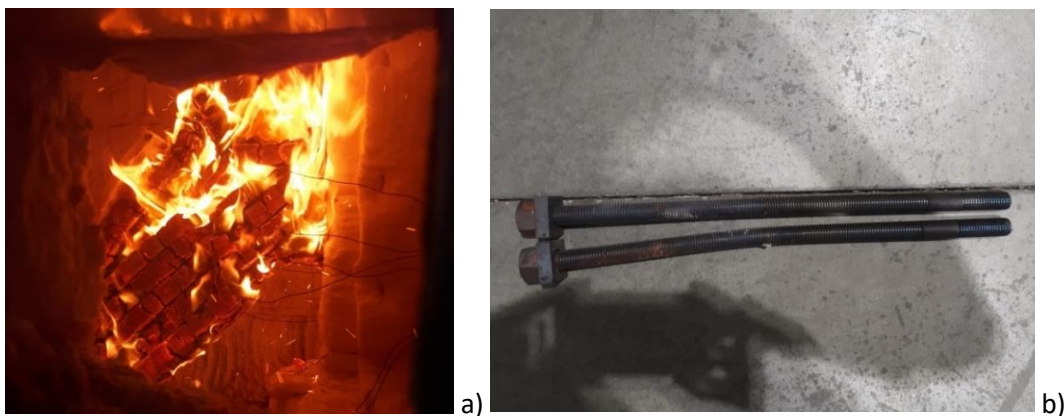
a) Test 200-1.5-A connection just after failure; b) Test 200-1.5-A steel rods after failure
